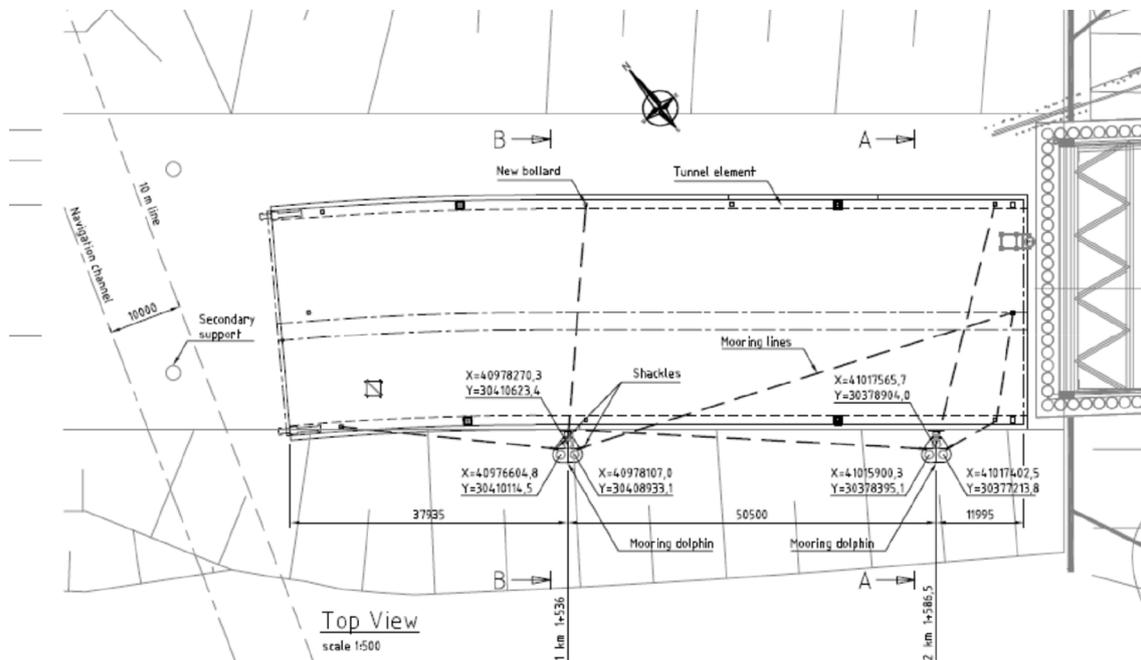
Moored location of tunnel element 1 outside dry dock.
